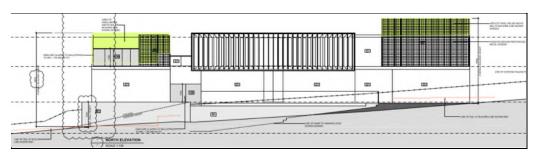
North Elevation showing yellow areas which exceed 6 metres in height (Without Prejudice Plans)
